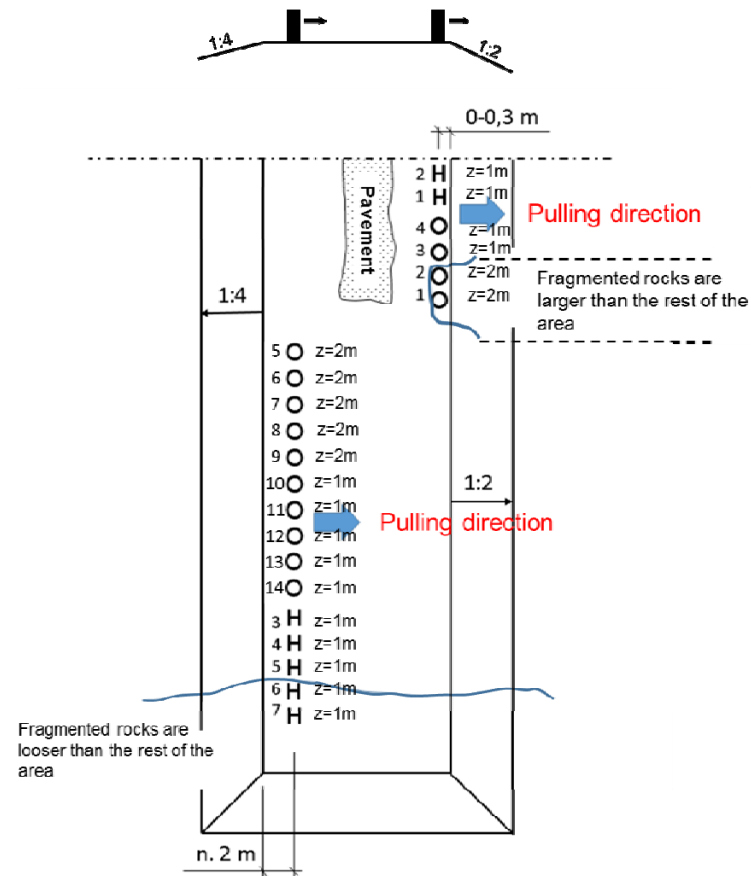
Pile installation layout in Fragmented Rock in Vantaa.
